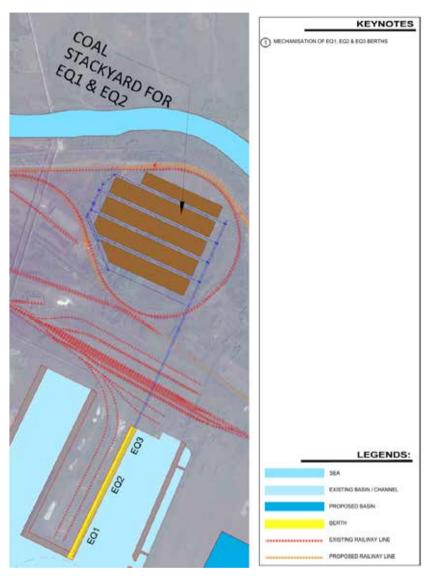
Location Plan of EQ 1 to EQ 3 Berths and Stackyard
